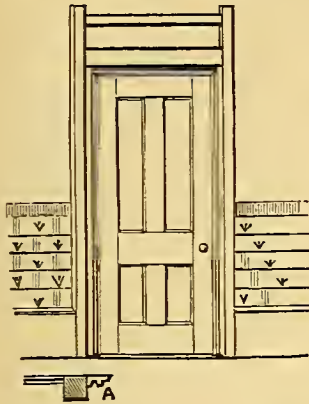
FRAME-WORK AS FOUNDATION FOR OVERDOOR.
